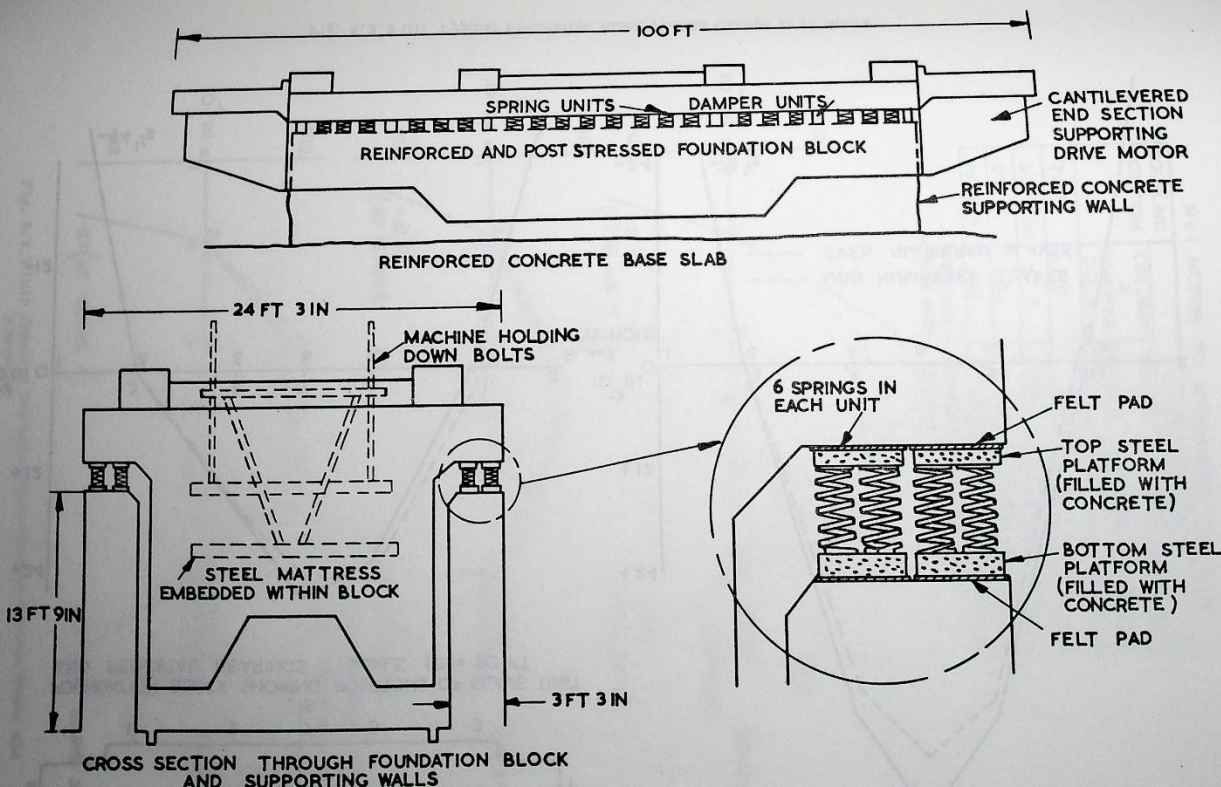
(i) Simplified Sketch of Rotating Plant Foundation Arrangement
